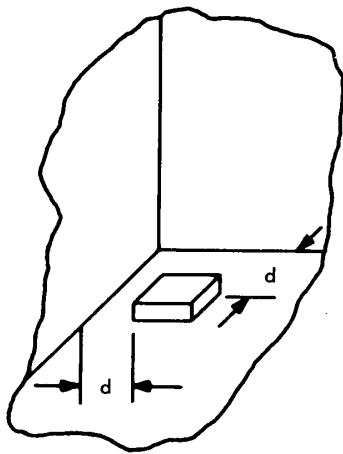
On Ground or Roof – Two Adjacent Reflecting Surfaces
